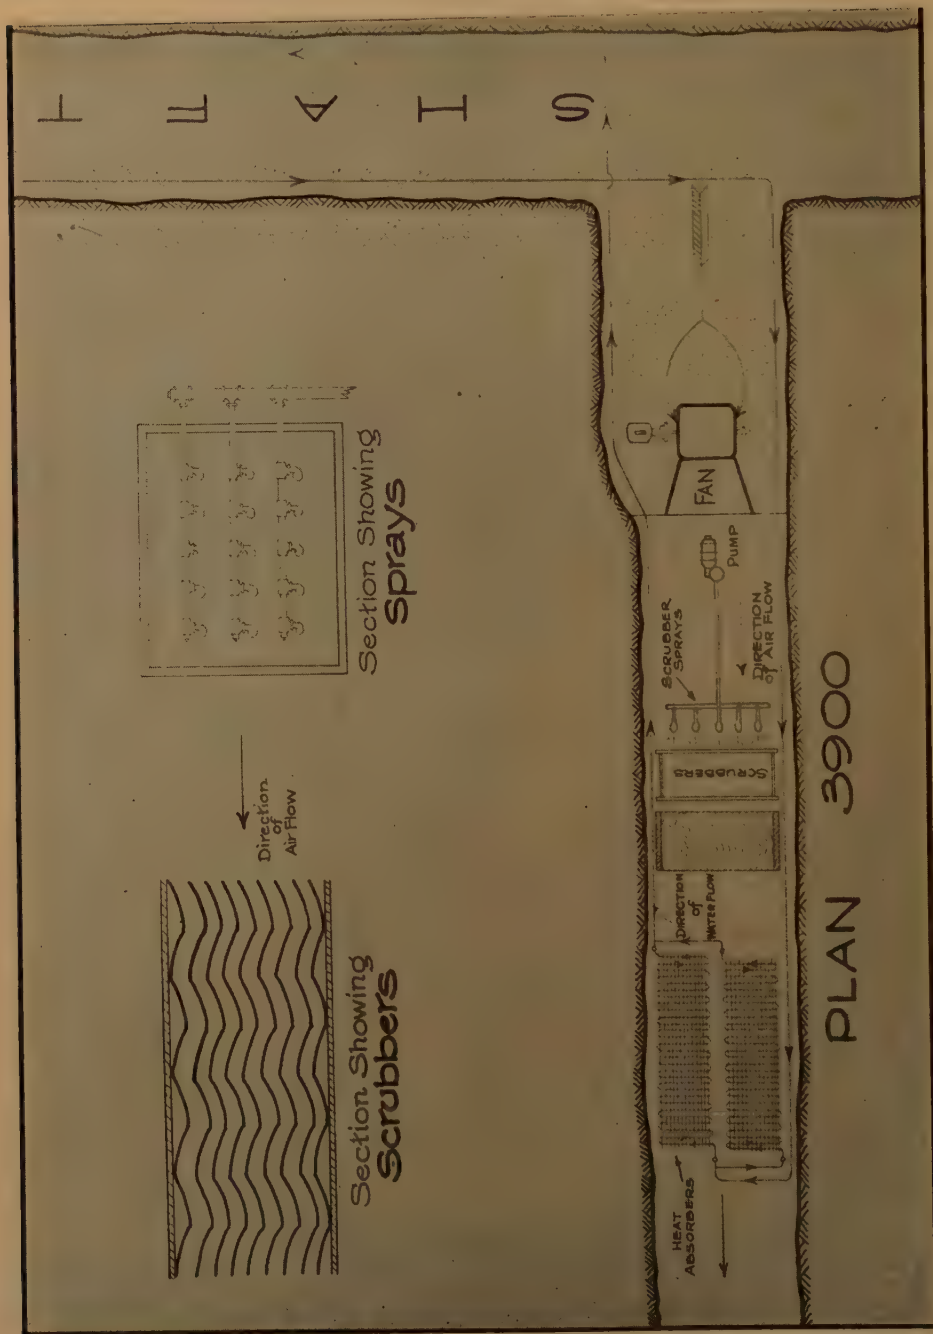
AIR-CONDITIONING PLANT ON 3900-FOOT LEVEL.
